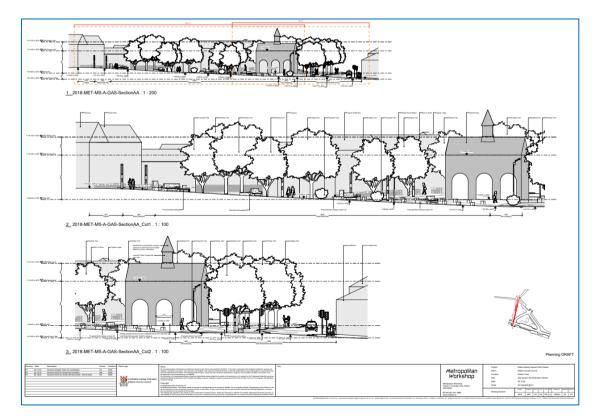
Site Section Plan (Source: Metropolitan Workshop)
